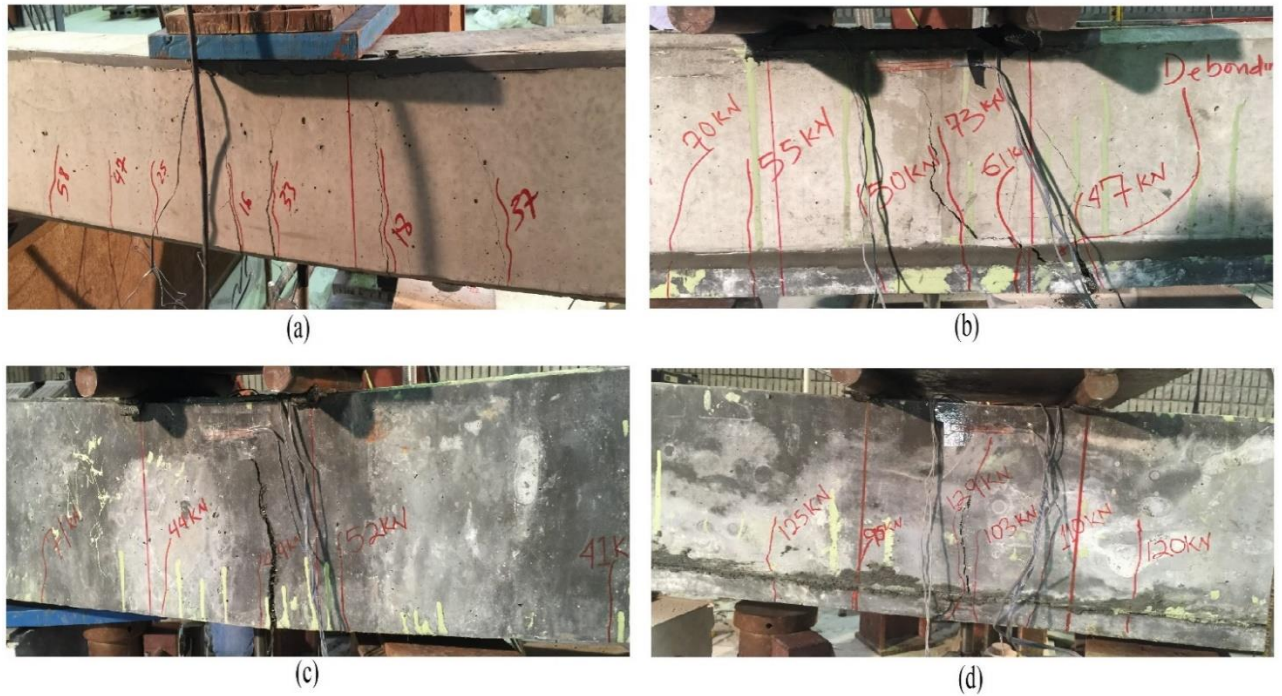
Crack patterns for epoxy bonded RC beam specimens (a) RC – Control (b)
